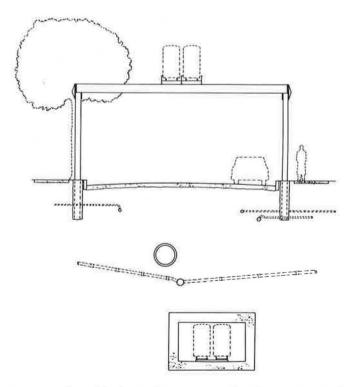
Street cross section with elevated tramways on "bent" support and subsurface tramway.
